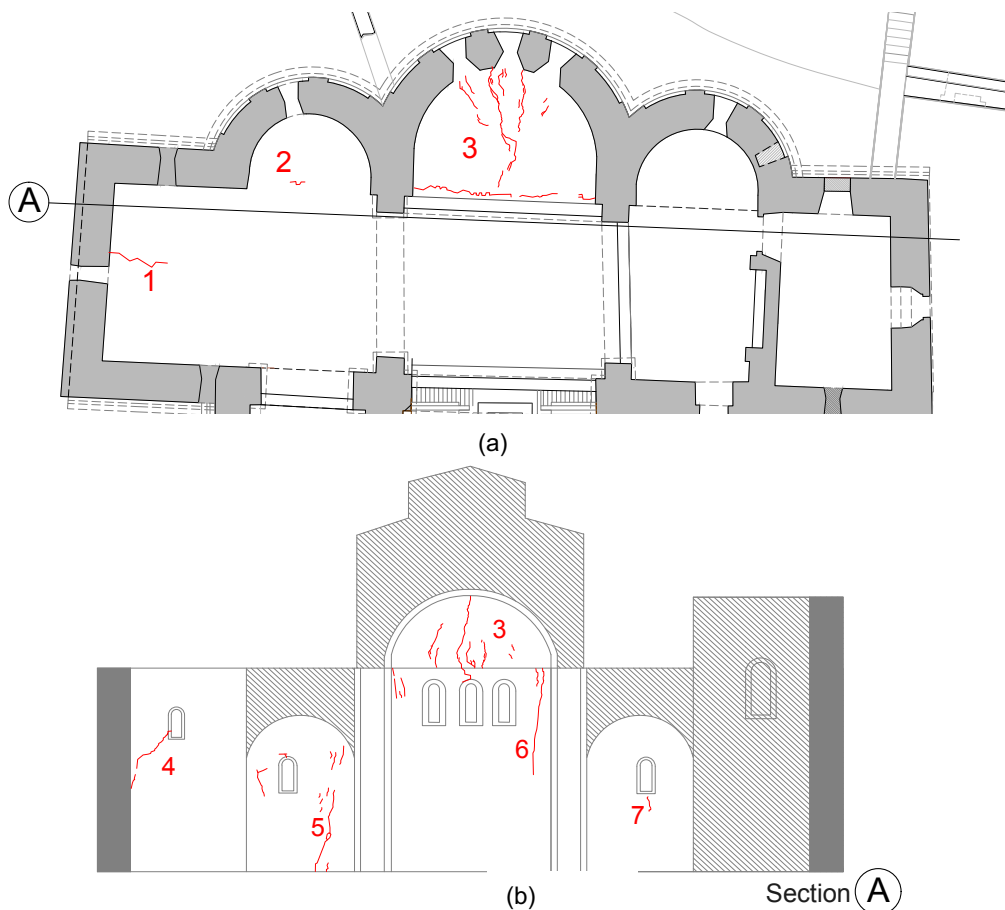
(a) Apse vault cracking and (b) north side chapel wall cracking in Sant Miquel de Cruïlles
